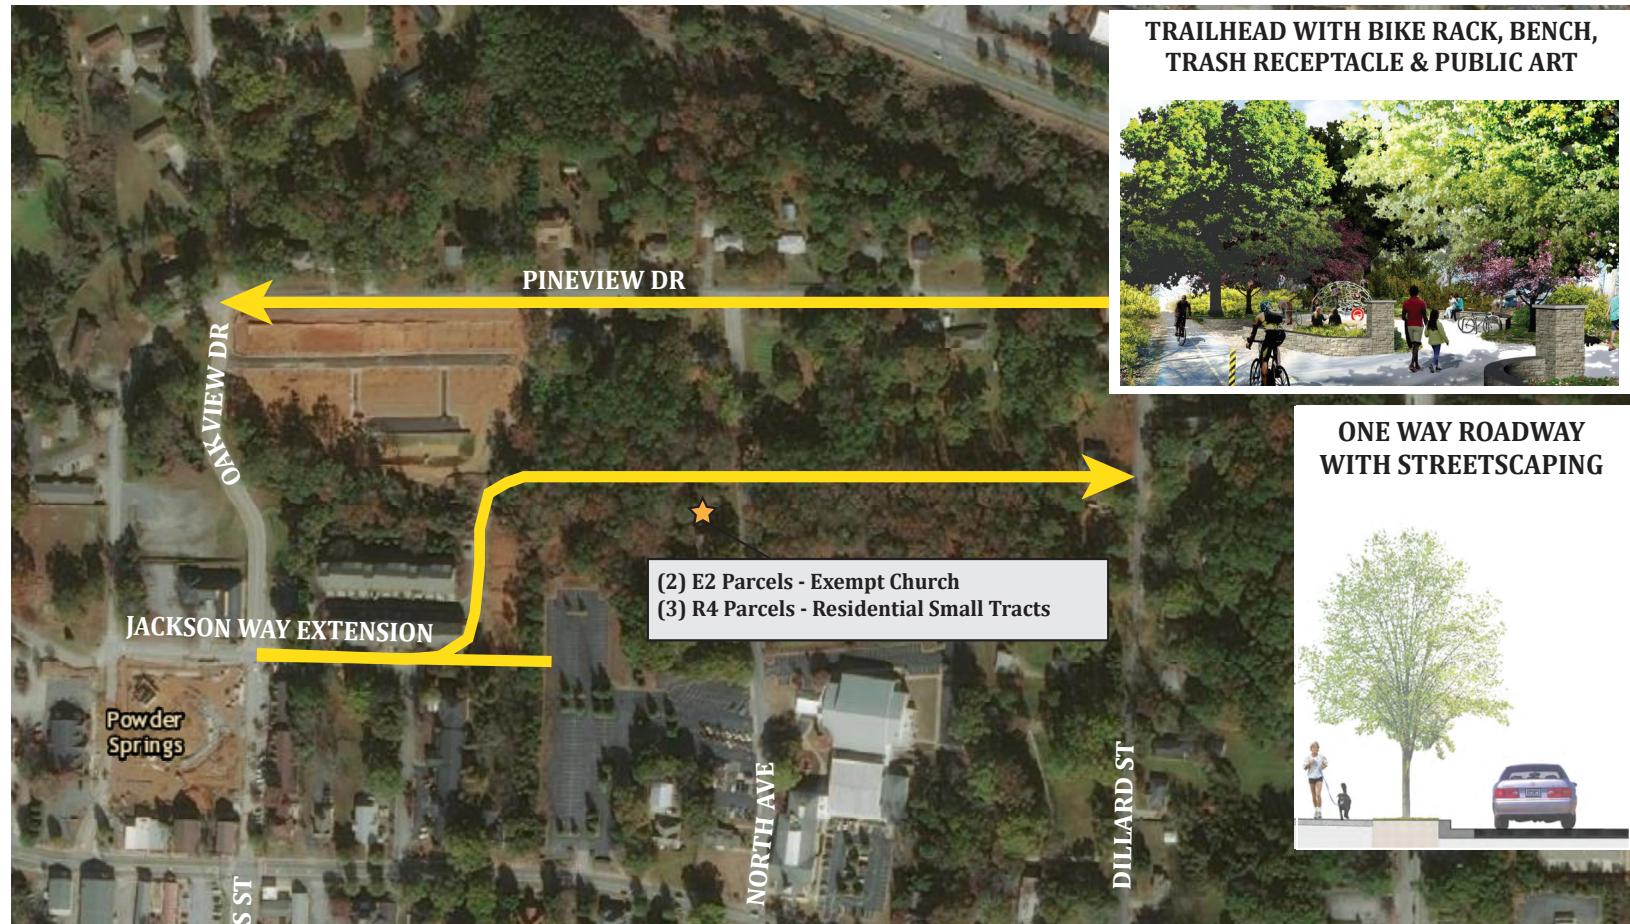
Potential Proposed One-Way Roadway Pair with Streetscaping and Trailhead at Silver Comet Trail
